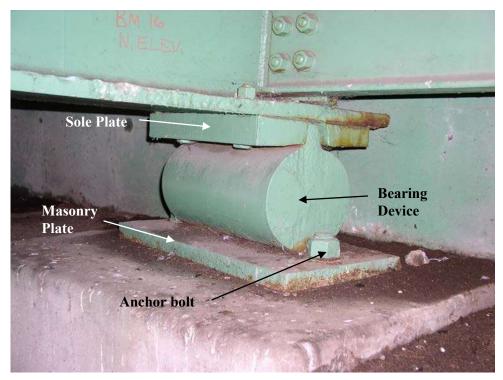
Steel Roller Bearing Showing Four Basic Elements
